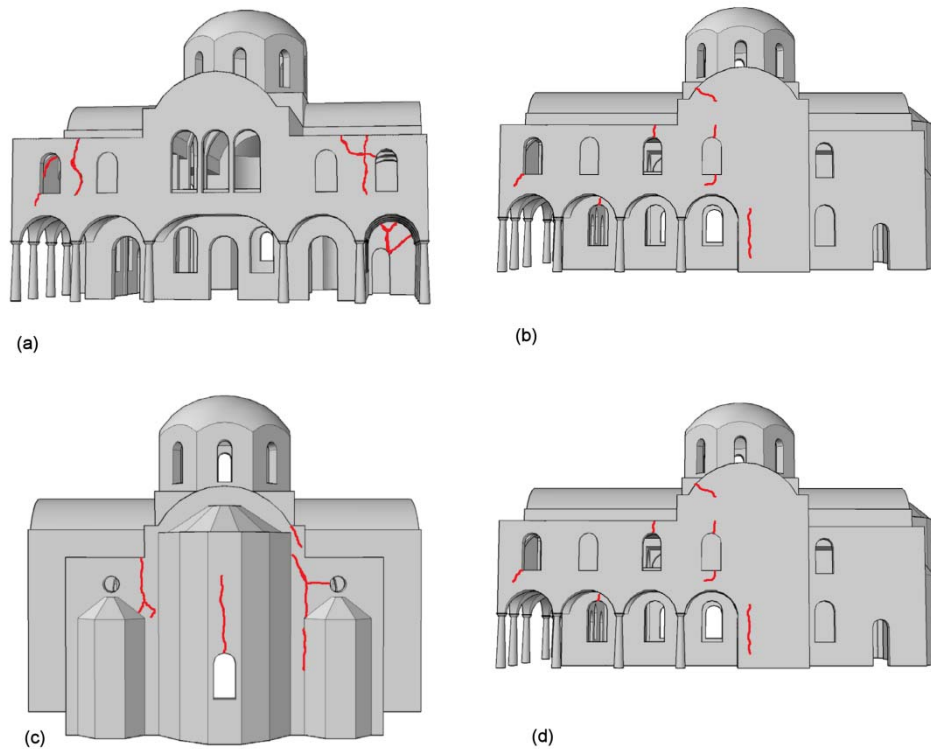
Major cracks in the masonry structure: (a) frontage (west façade); (b) south façade; (c) east façade; (d) north façade.
